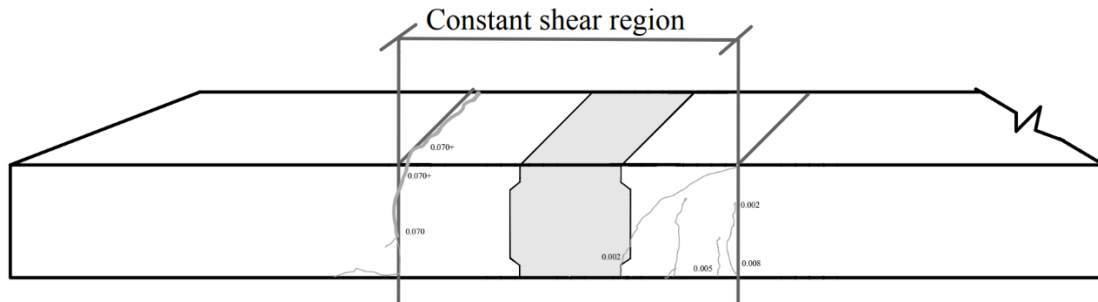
Crack Propagation for Proprietary Short-Term Specimen at Failure
